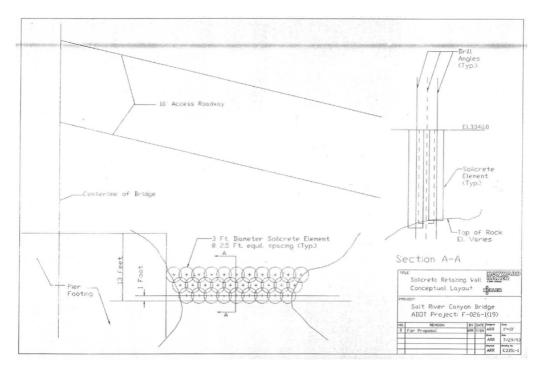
Layout of the jet grout columns surrounding the scour hole.
